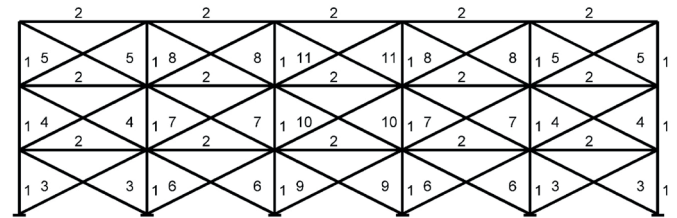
Schematic and grouping of the 5-bay and 3-story frame with all braces
